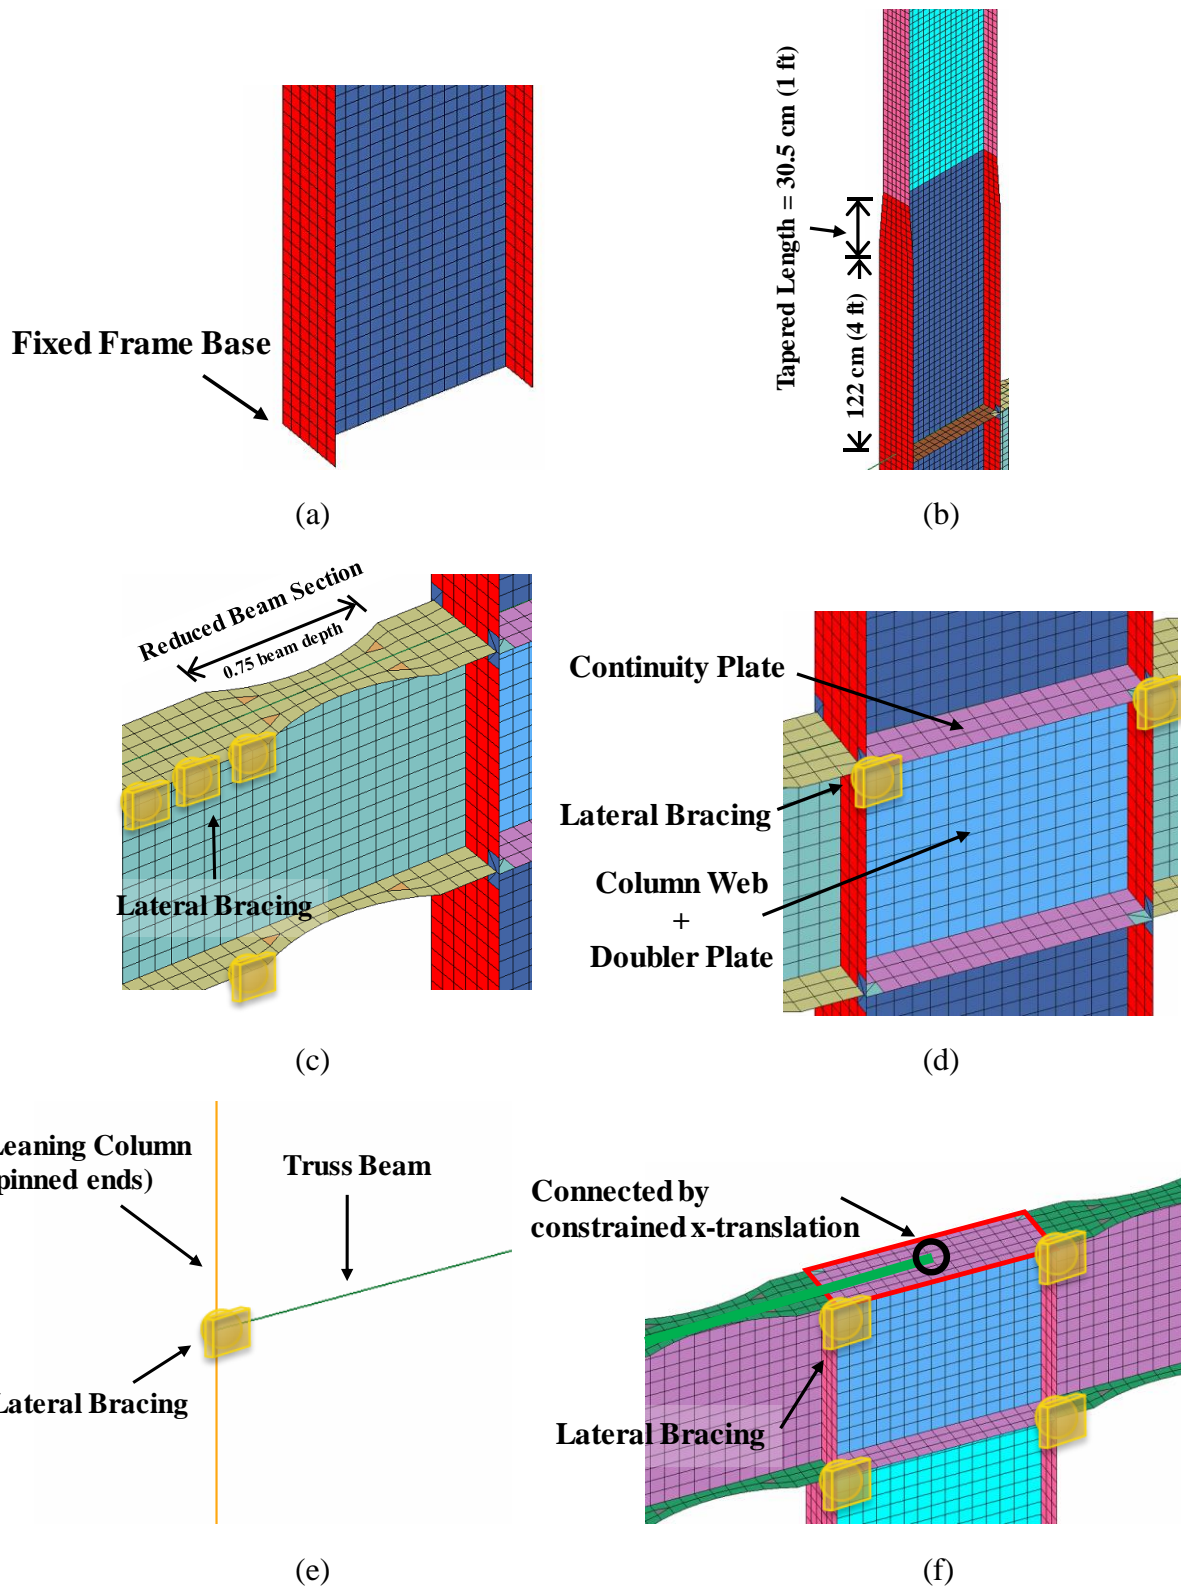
Details of the frame model. (a) frame base; (b) column splice; (c) reduced beam section; (d) beam-to-column connection; (e) leaning column and truss beam; and (f) connection between truss beam and the frame
